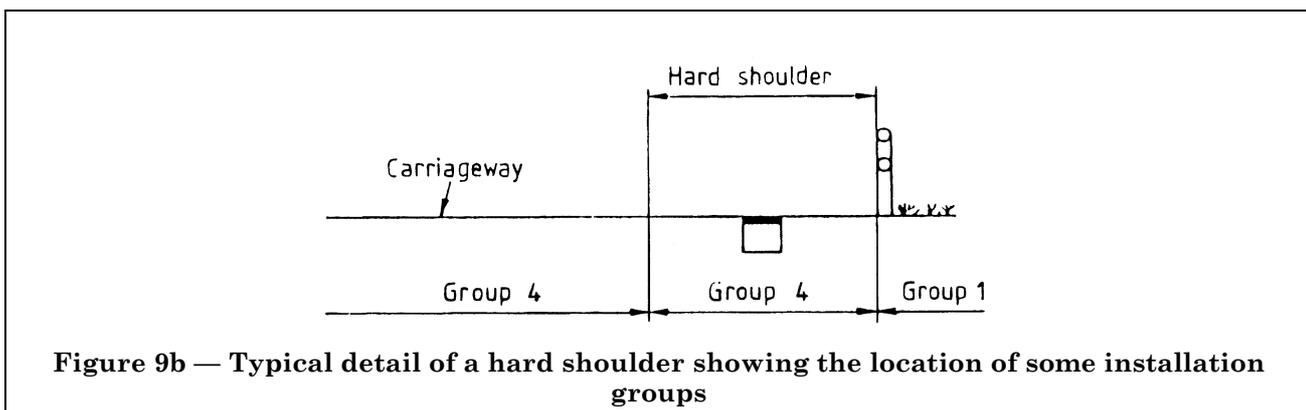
Typical detail of a hard shoulder showing the location of some installation groups
